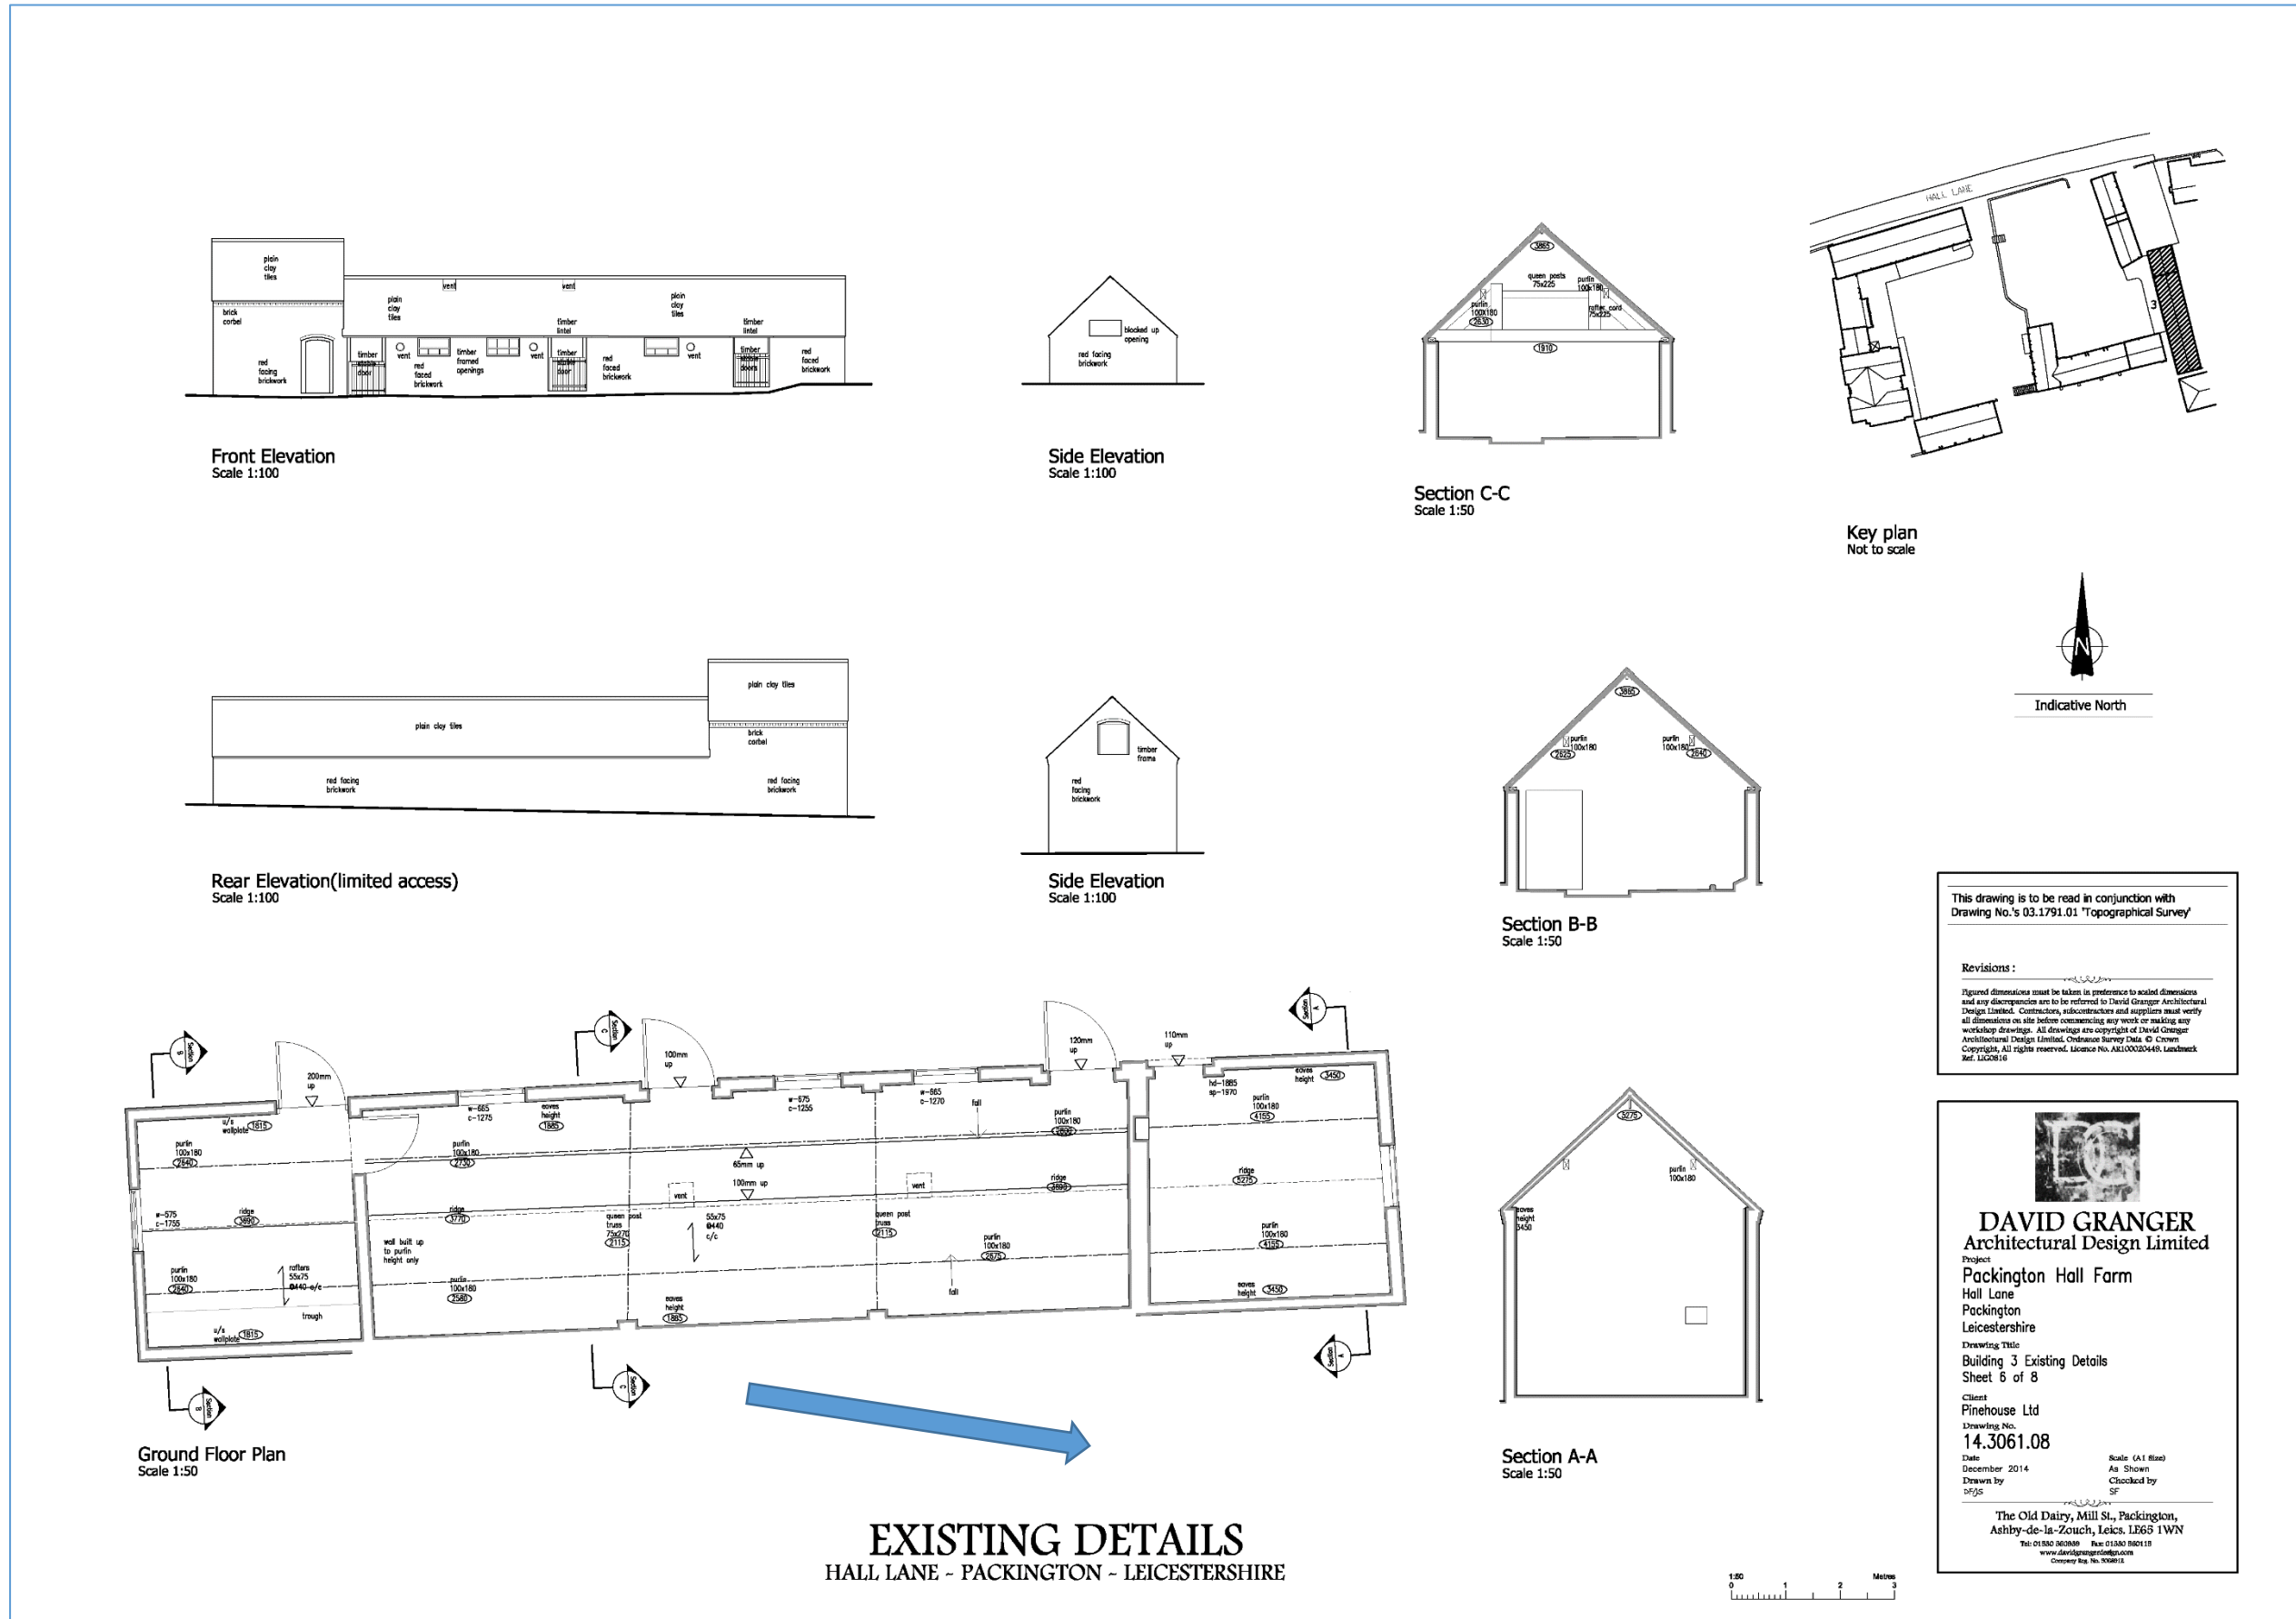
Block B: floorplans, elevations, sections. Provided by client
